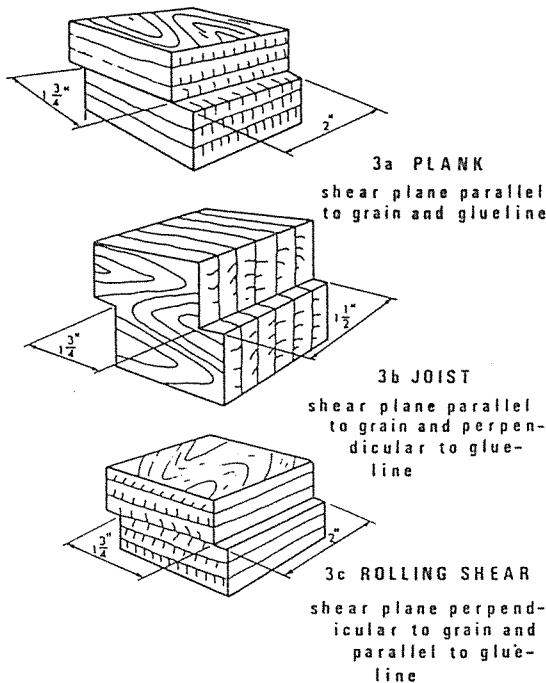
LVL block-shear-specimen orientation and nominal (2 in. by 2 in.) cross section dimensions.
